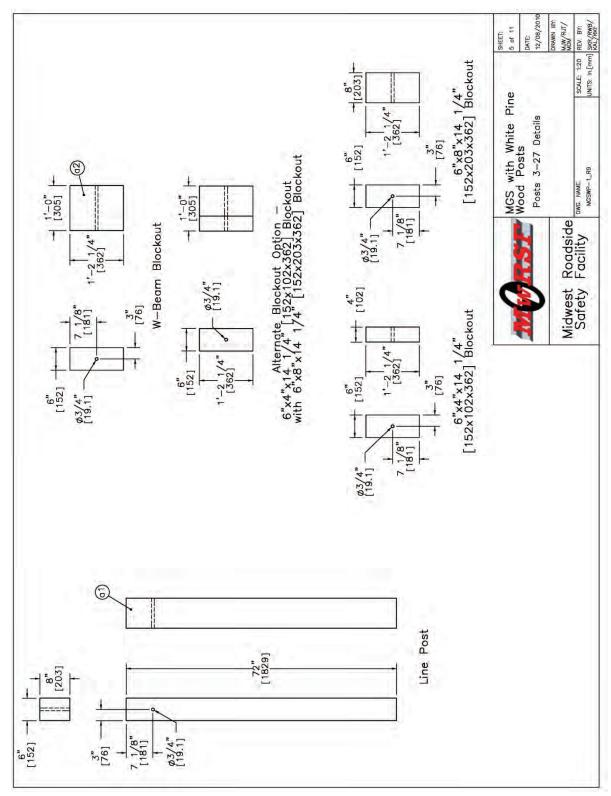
Line Post and Blockout Details, Test No. MGSWP-1
